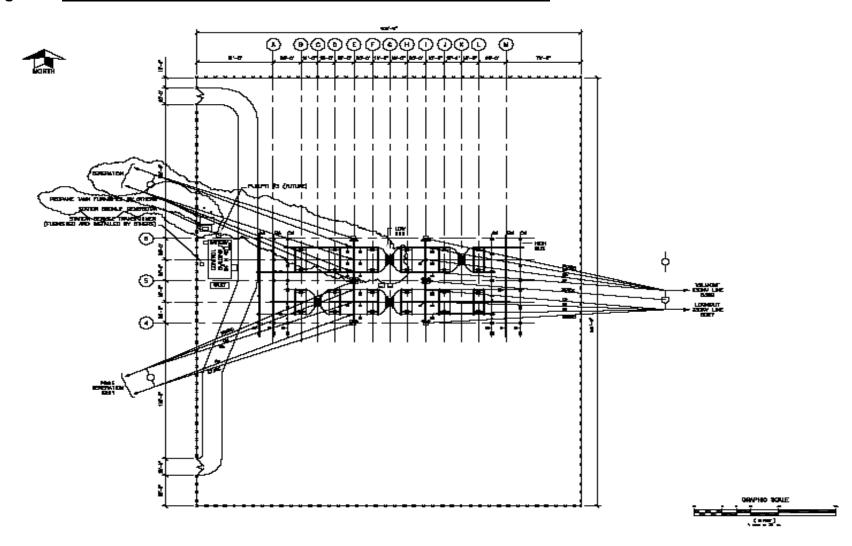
Plains End Substation: Proposed General Arrangement Drawing
